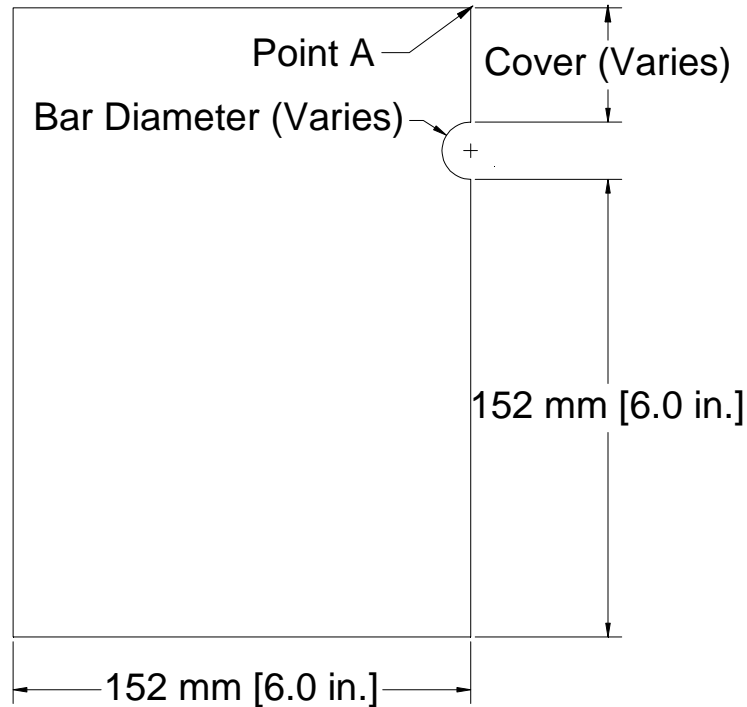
Two dimensional finite element model of concrete cracking behavior.
